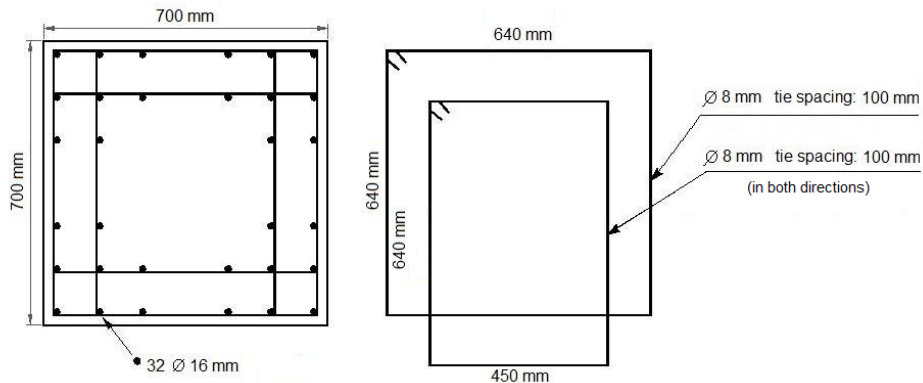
Geometry of the cross-section and reinforcement arrangement of prototype column
